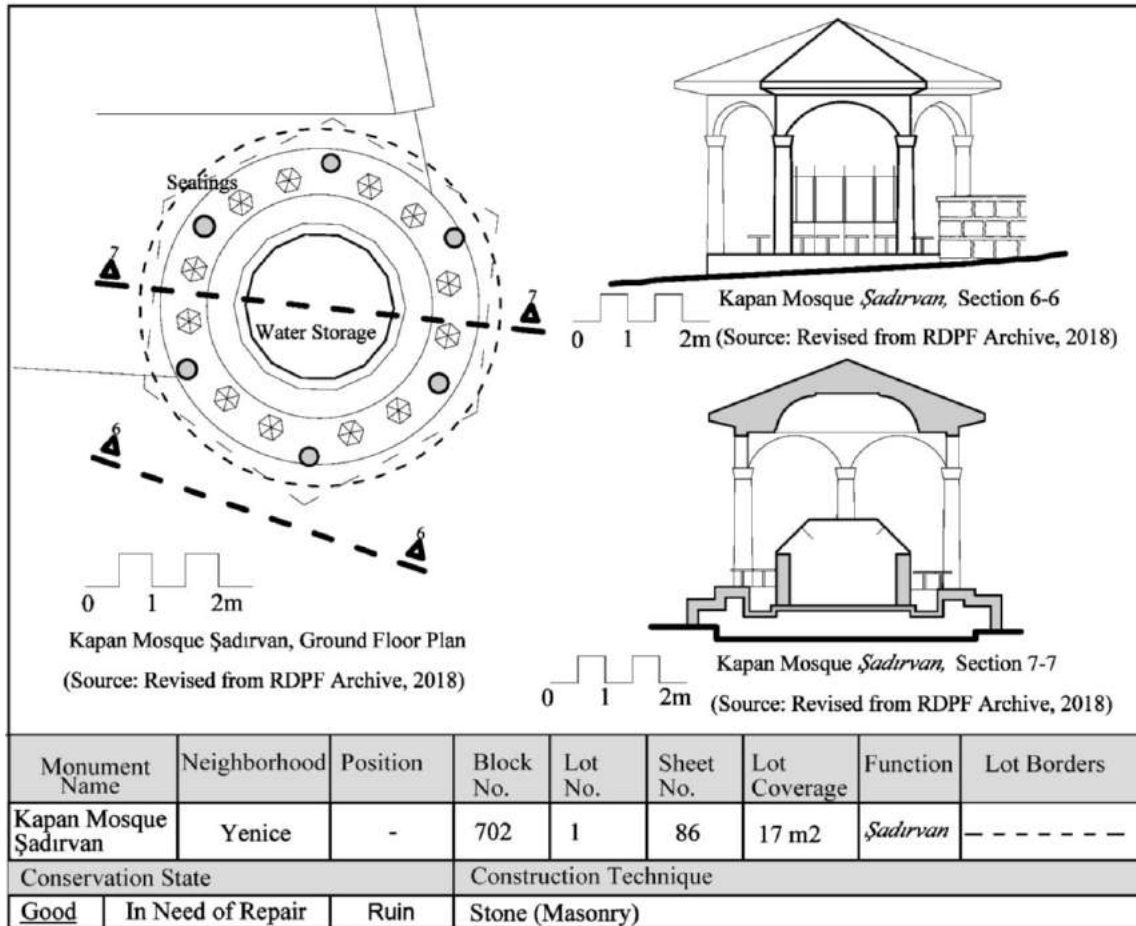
Ground floor plan and sections, Kapan Mosque Şadırvan
